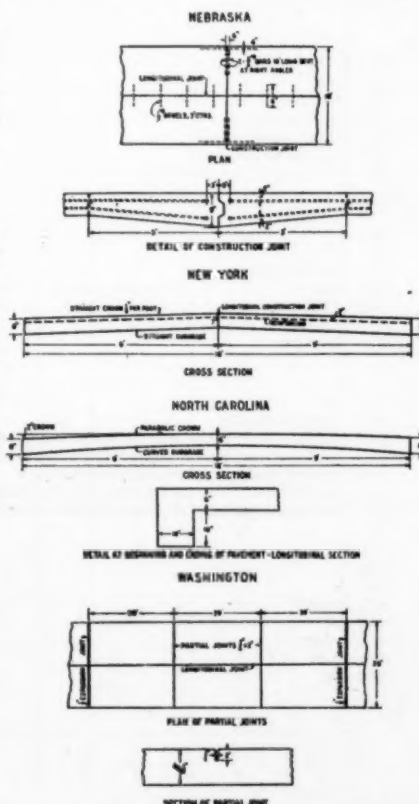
Special Features of Concrete Pavement Designs Used in 1926
